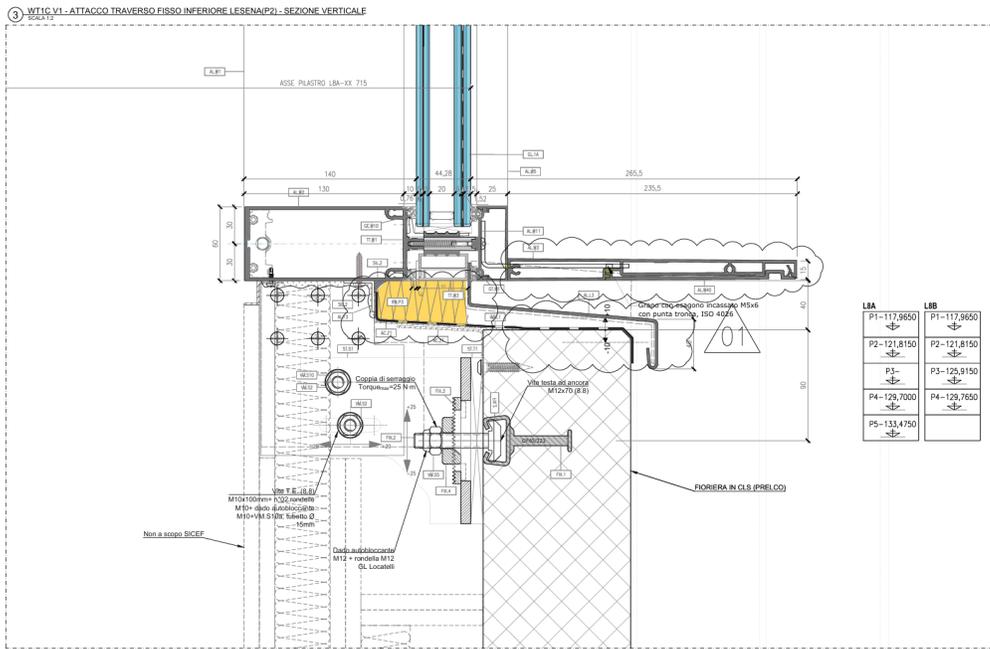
Standard Bottom Bracket Connection Detail developed with AutoCAD: Author
